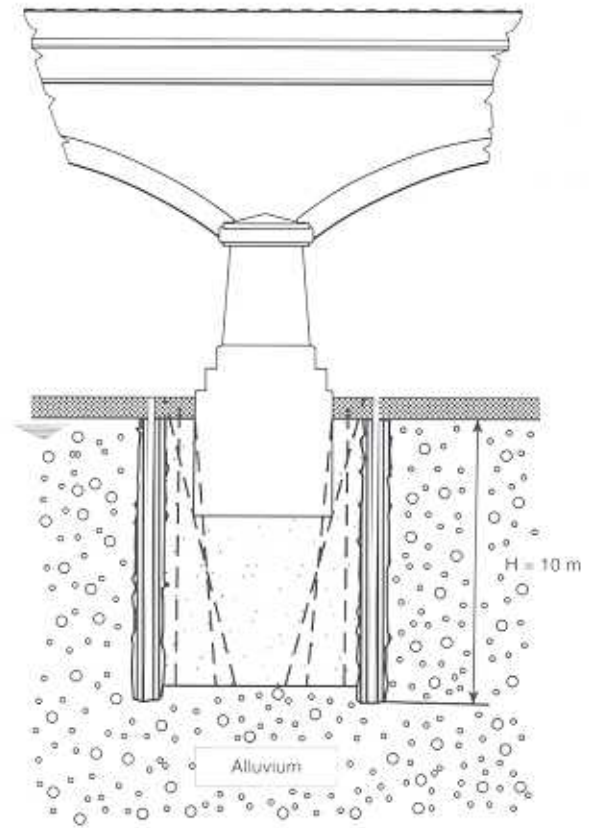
Design used for repairing the foundations of the Taro River railway bridge
